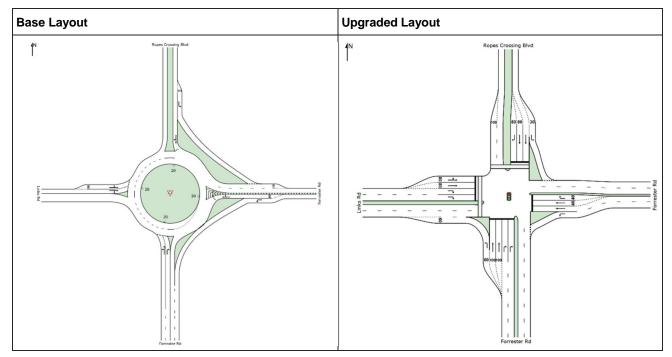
2021 without Links Road extension - Forrester Road/Ropes Crossing Boulevard/Links Road
